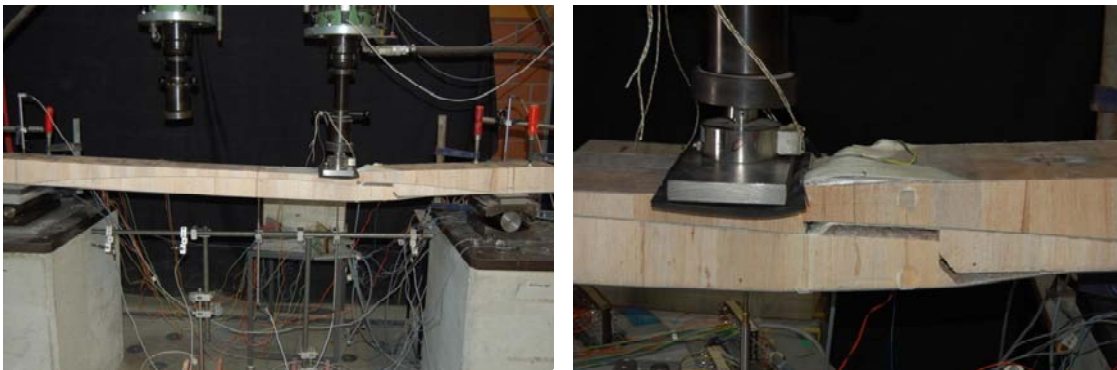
Failure of beam B-H/L-3 (left), zoom of detailed failure mode (right)
